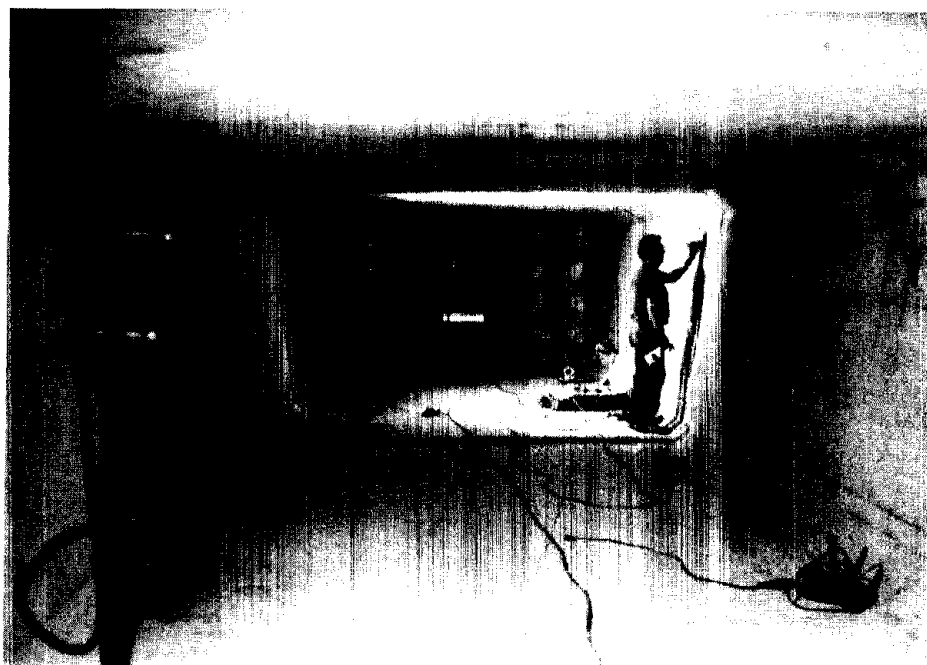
Potential survey on post-tensioned box girders in Spans 19 and 21.
